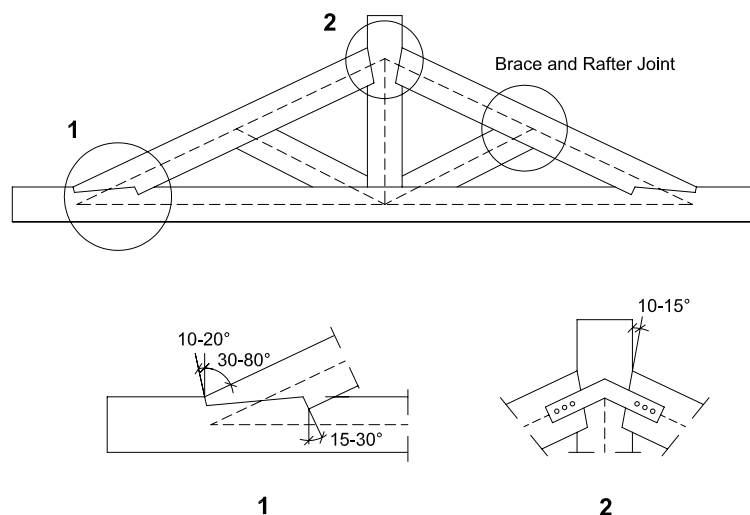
Typical timber roof structure in traditional constructions, with details: connection between rafter and chord (1) and between rafter and king post (2).
